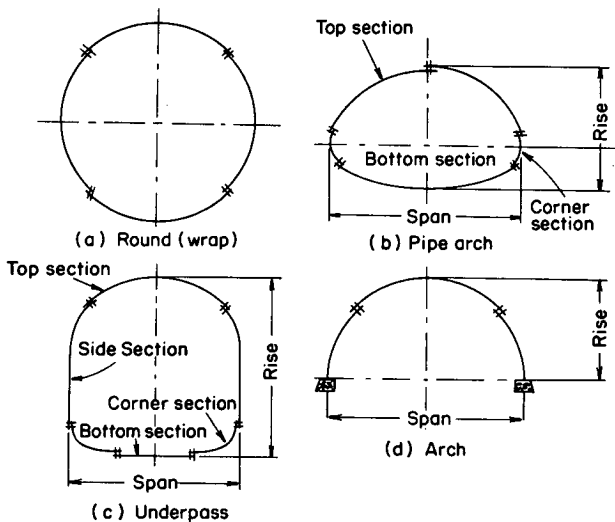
Sectional shapes of corrugated metal pipe culverts.
